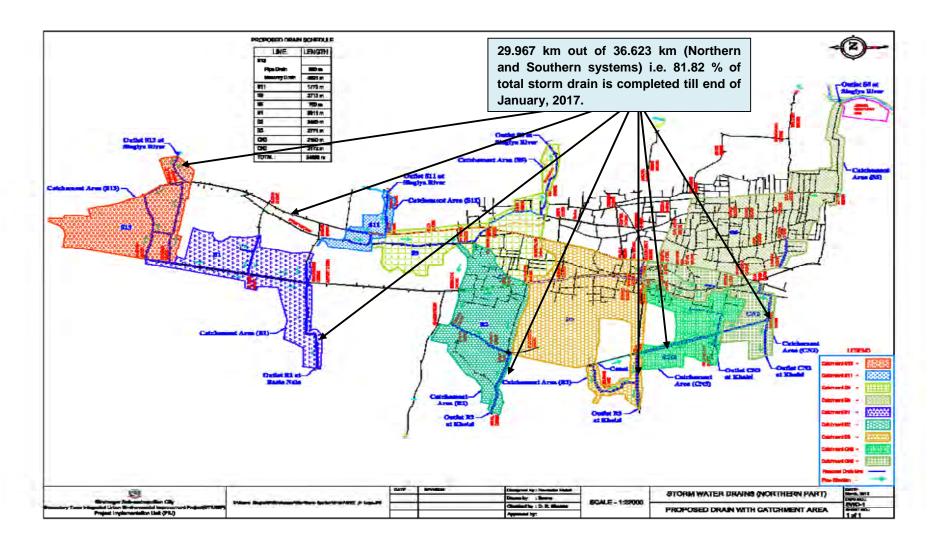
Proposed Storm Water Drains in BSMC (Northern Drainage System)
